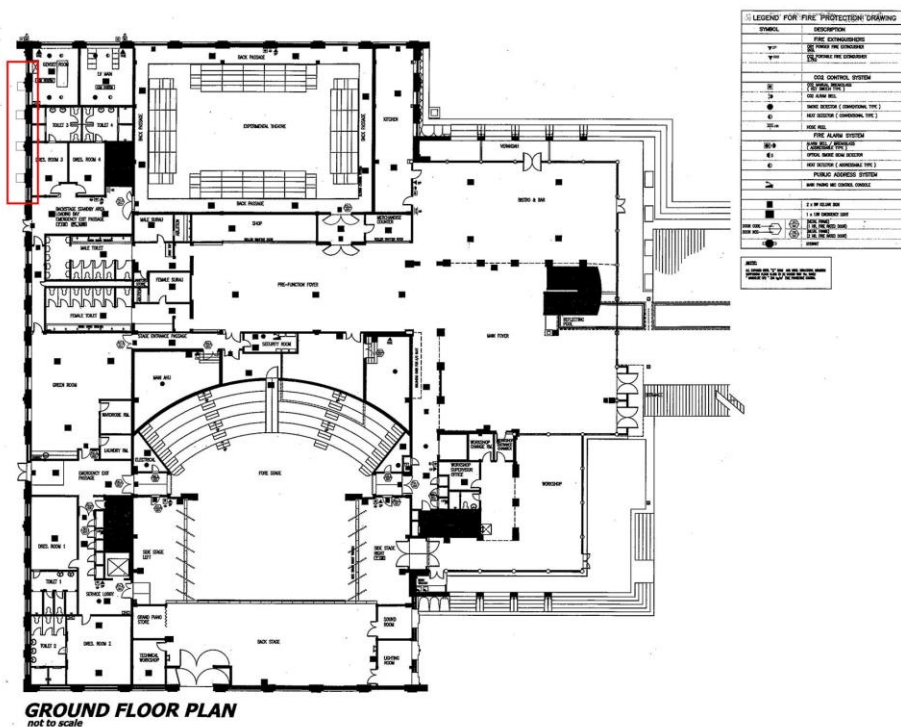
Ground floor plan of KLPAC showing the location of fire exhaust fan
